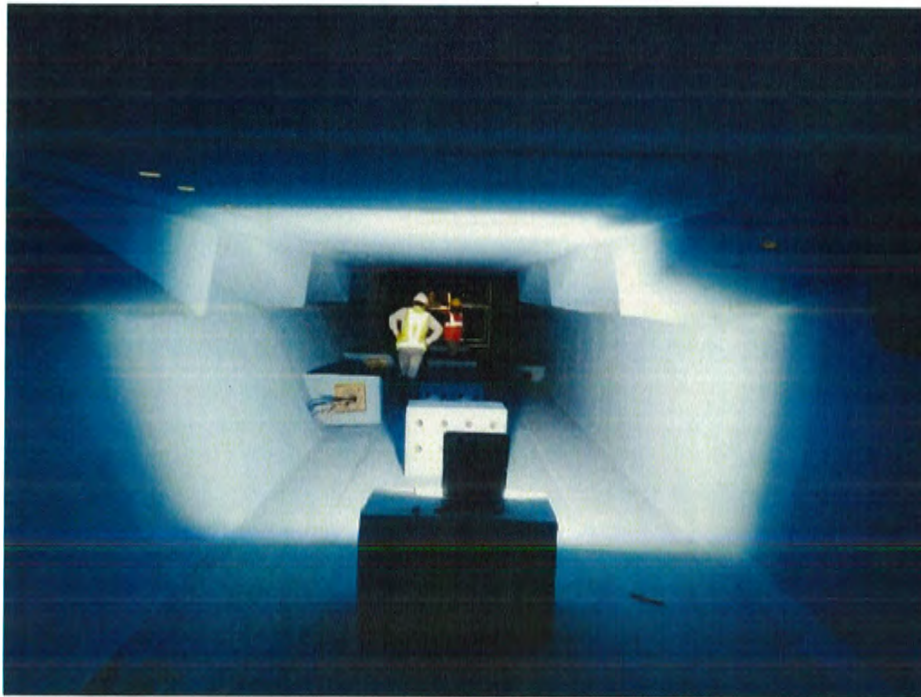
Span LMP 281-282 (Segment inner face) Anti-carbonation paint coating work
